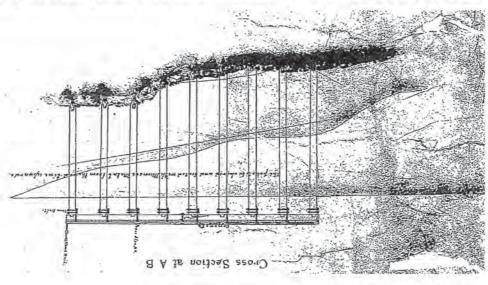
1853 Detail of plan for the extension of the semicircular quay showing the plan for piles for the whart decking. Each was tipped piles were to be positioned at regular intervals in a grid pattern, then topped with cross beams and timber decking. Each was tipped with a metal cap for driving through the stream bed and into the harbour floor. (Source: State Records of NSW AO Plan 5641)
